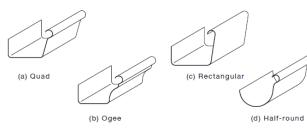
(A) TYPICAL EXTERNAL EAVES GUTTERS
